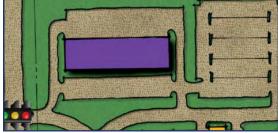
Station Area Plan-'Industrial Buildings' The architectural guidelines of District 4 apply to the building highlighted in purple.
